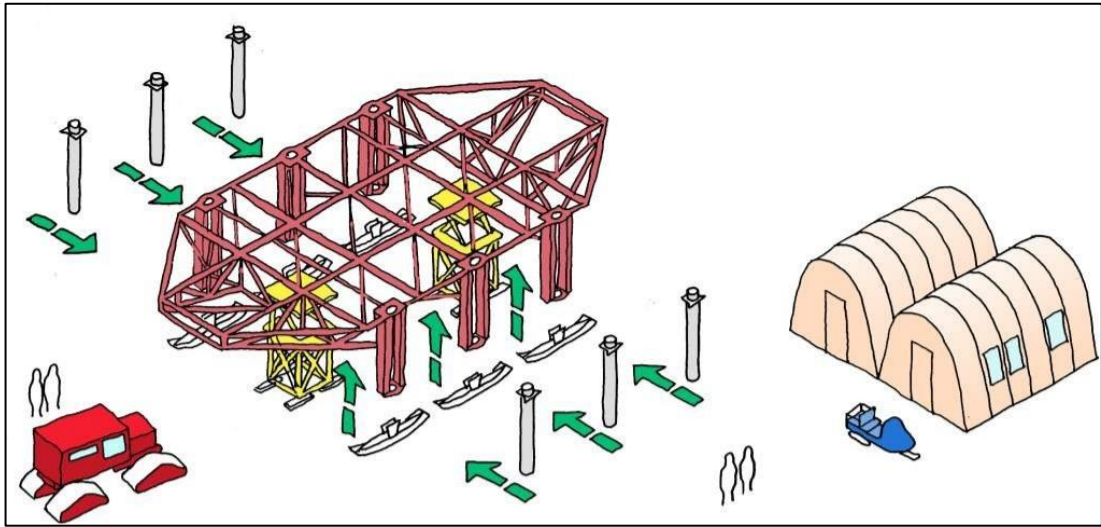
Stage 2: Once the structure transported to Antarctica, hydraulic legs and runners are implemented [66].
